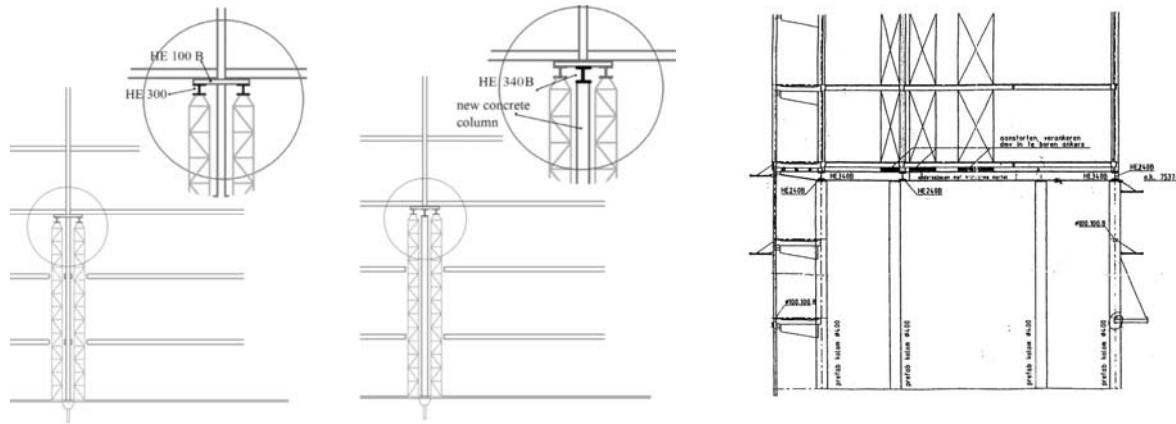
Mounting final structure of concrete columns with HE340B on top (Temporarily support structure); Assembling of the bearing structure of the winter garden (right)
